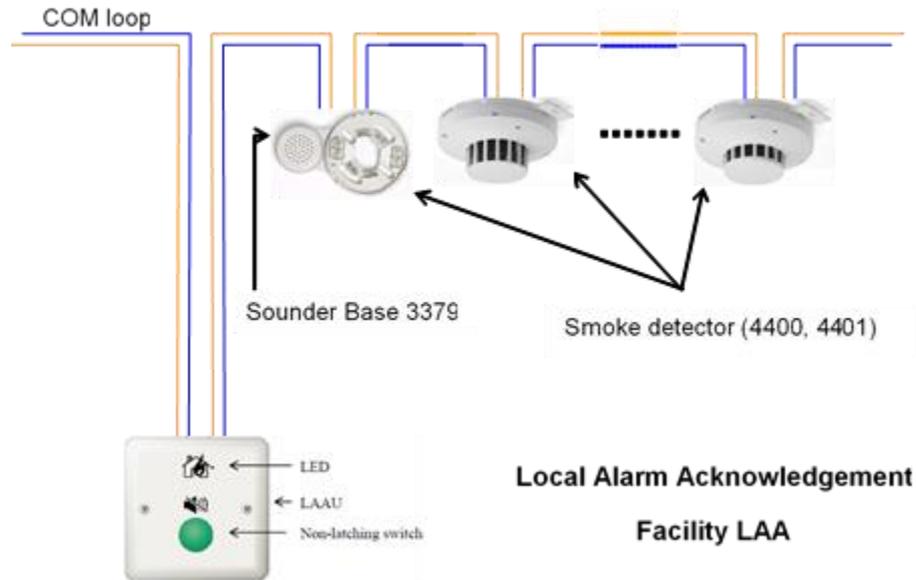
Local Alarm Acknowledgement Facility Connection Diagram
